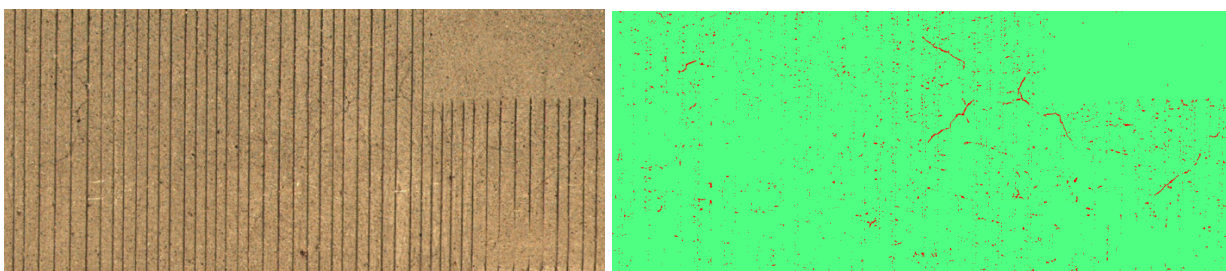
Detecting Cracks on Concrete Bridge Decks
